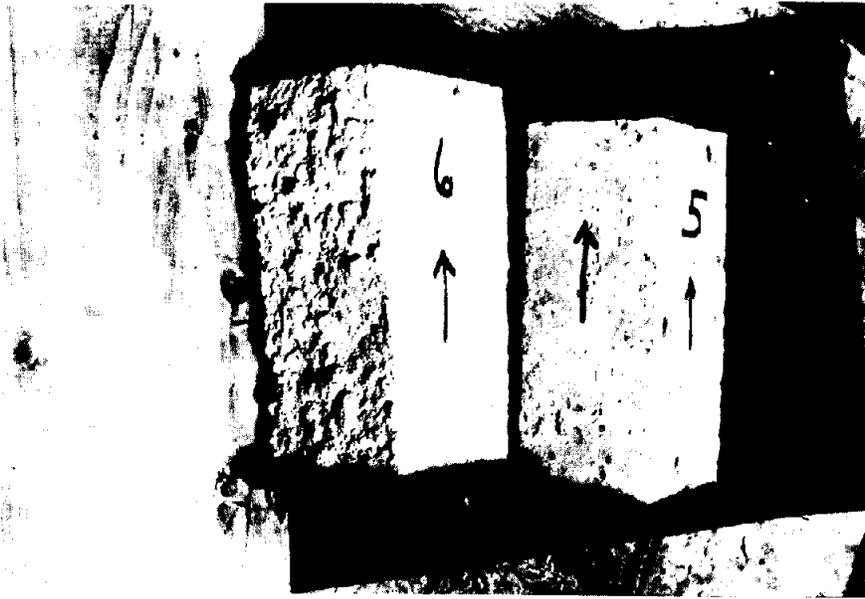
TYPICAL PRISMATIC ROUGH AND TRIMMED COMPRESSION SPECIMENS
